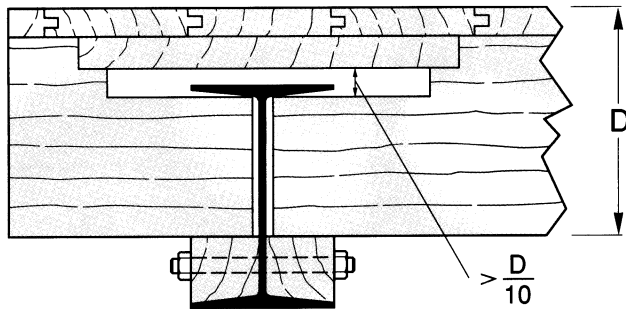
Design to avoid humping of a drying timber floor over a steel beam
